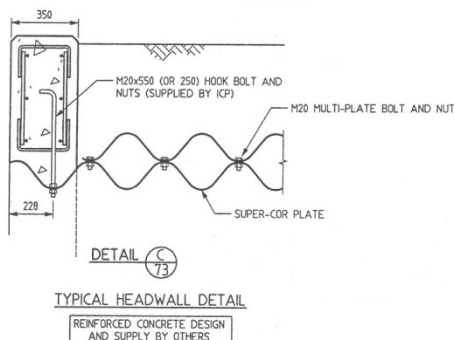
Typical headwall detail - Edge of culvert fixed by concrete headwall (Ingal Civil Products, 2002)
